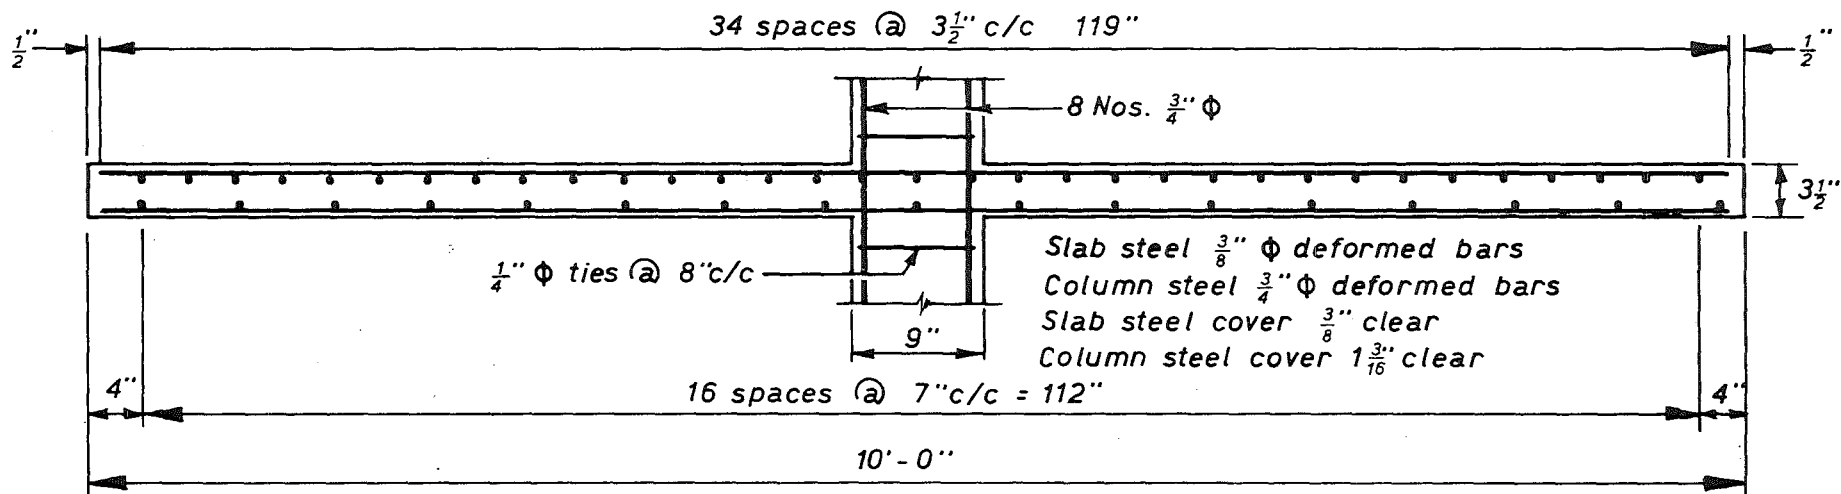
SLAB-COLUMN TEST SPECIMEN
